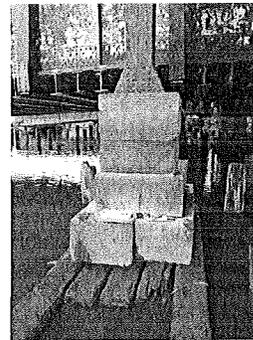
Pedestal # 9, granite courses with missing pointing and grillage in poor condition, looking north.
